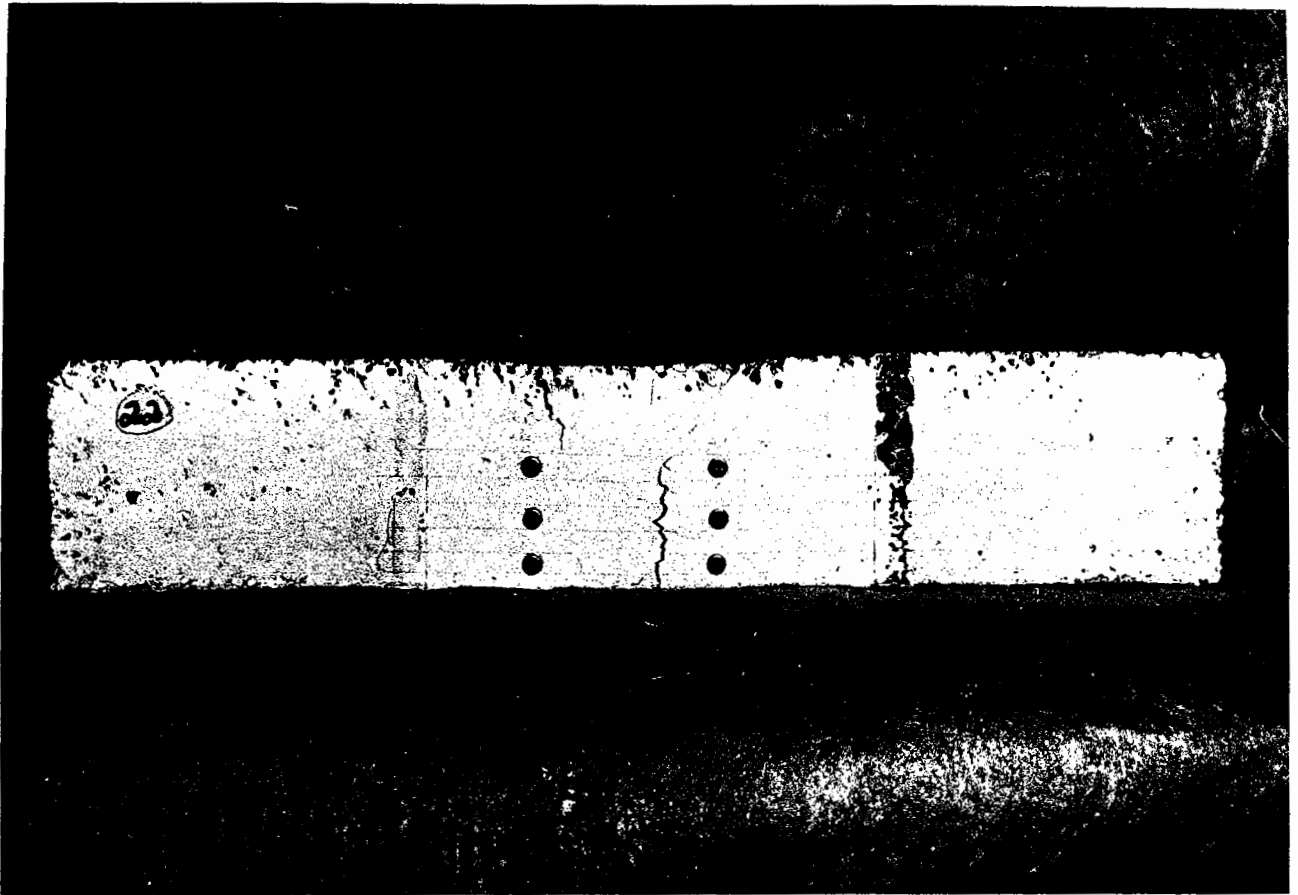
(a) Beam Test 22 ; 75mm Geotextile Interlayer
